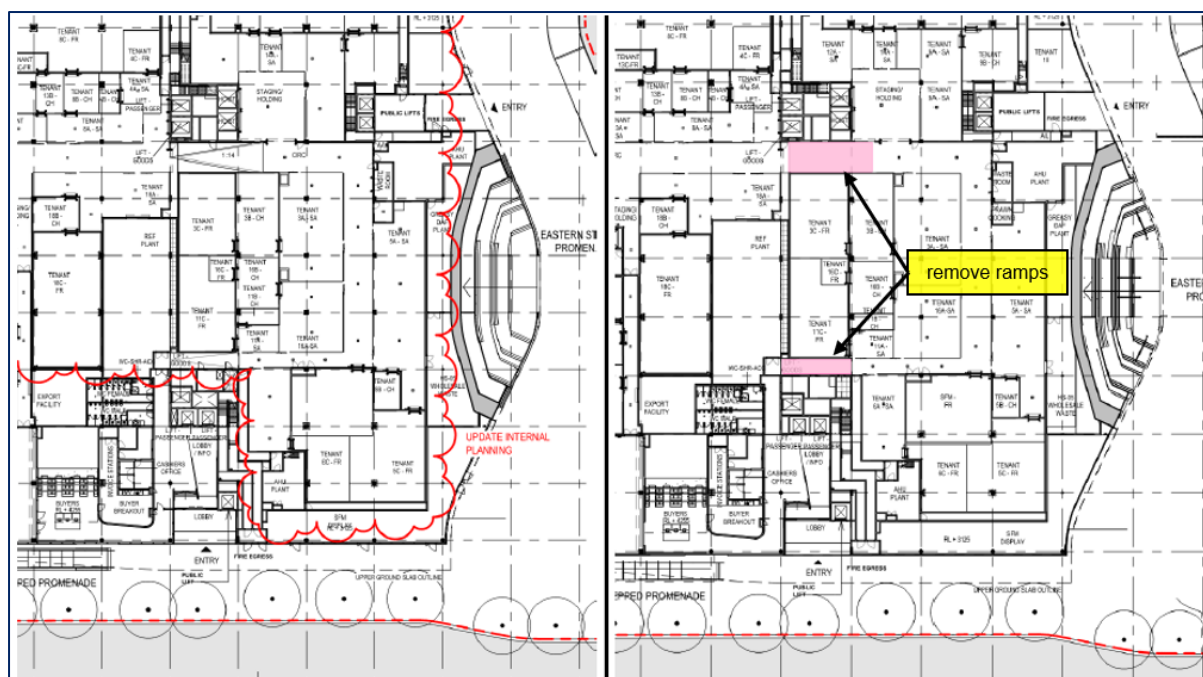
| The approved ground floor plan (left) and proposed (right) (base source: Modification Report)
